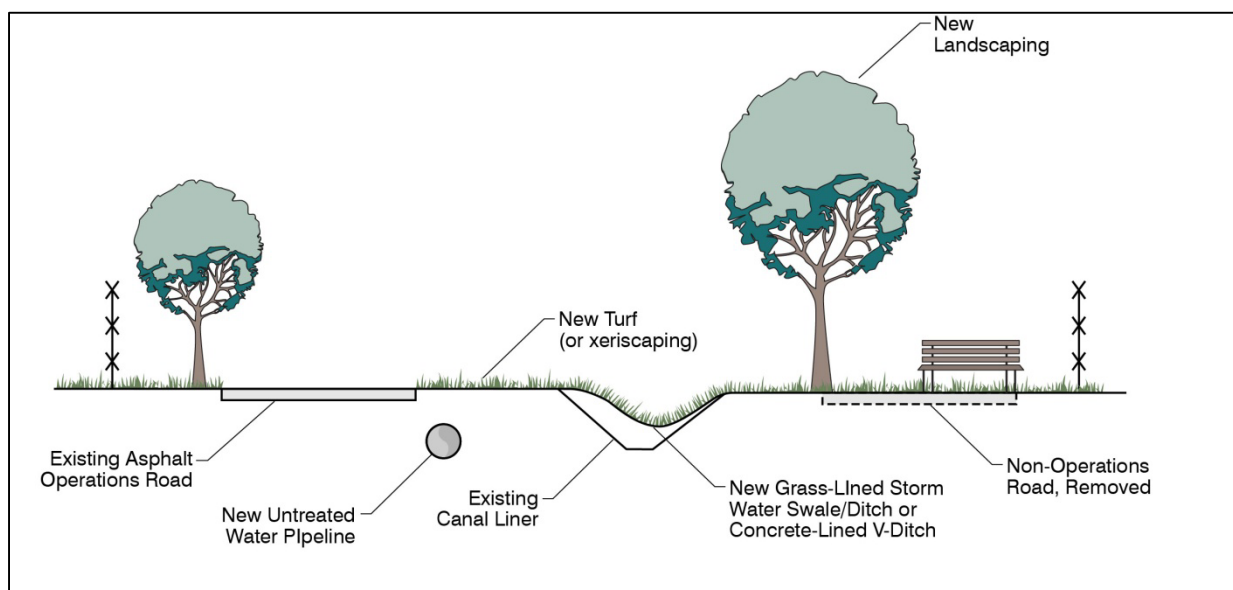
Pipeline Installed in the Ygnacio Canal at MP 1.5
